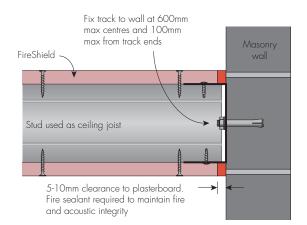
Non-Trafficable Ceiling to Masonry Wall
